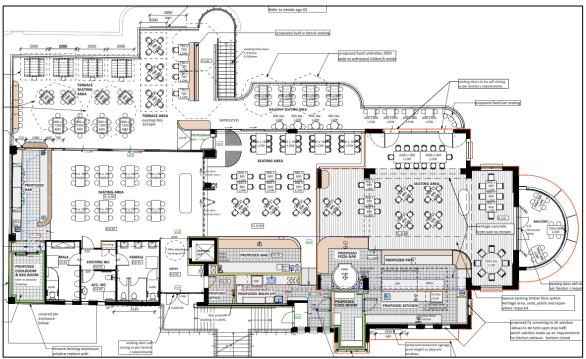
Restaurant Floor Plan (source: Southworth Architects)
